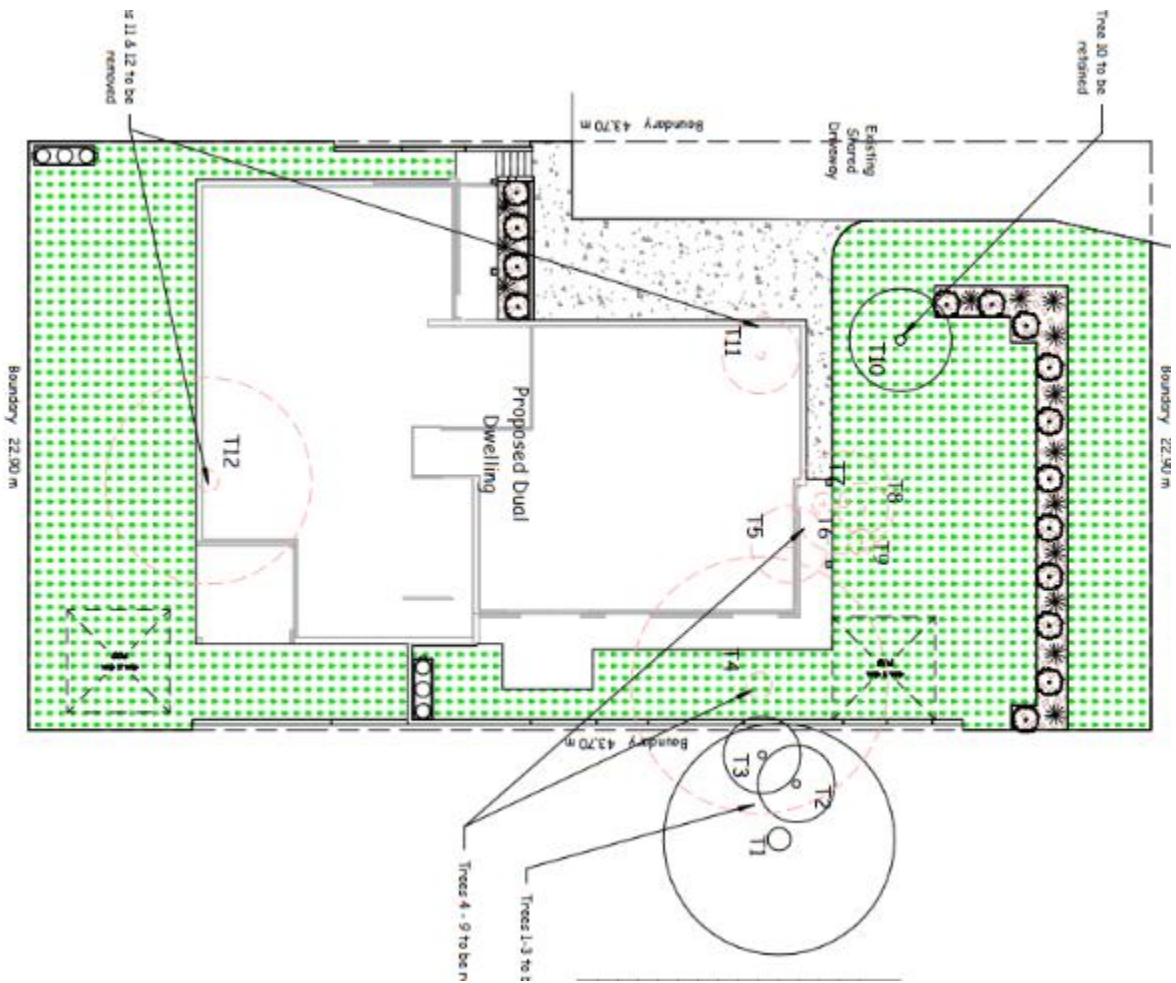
Extract of plan showing eight (8) to be removed, one (1) tree to be retained on site and three (3) trees on adjoining land to be retained.
